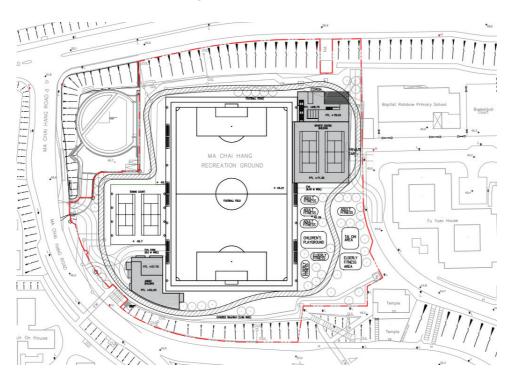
Master Layout Plan under Approved S16 Application Scheme
